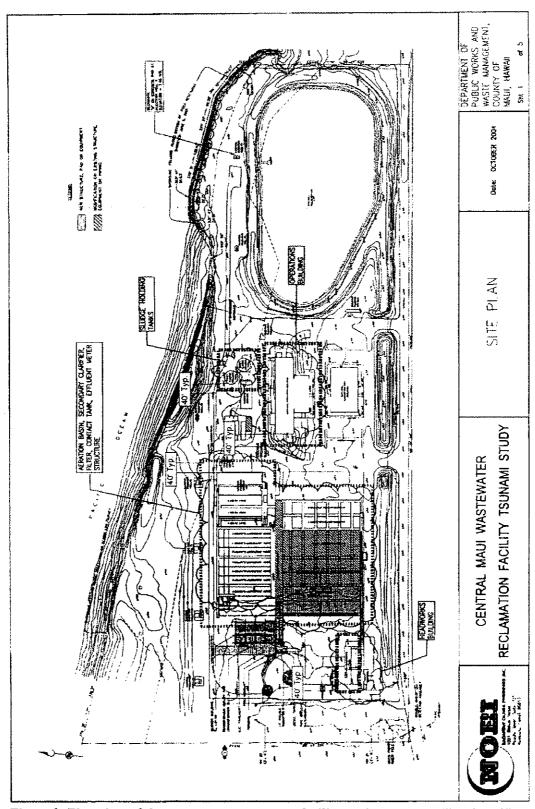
Plan view of the wastewater treatment facility; red areas to be "hardened".
